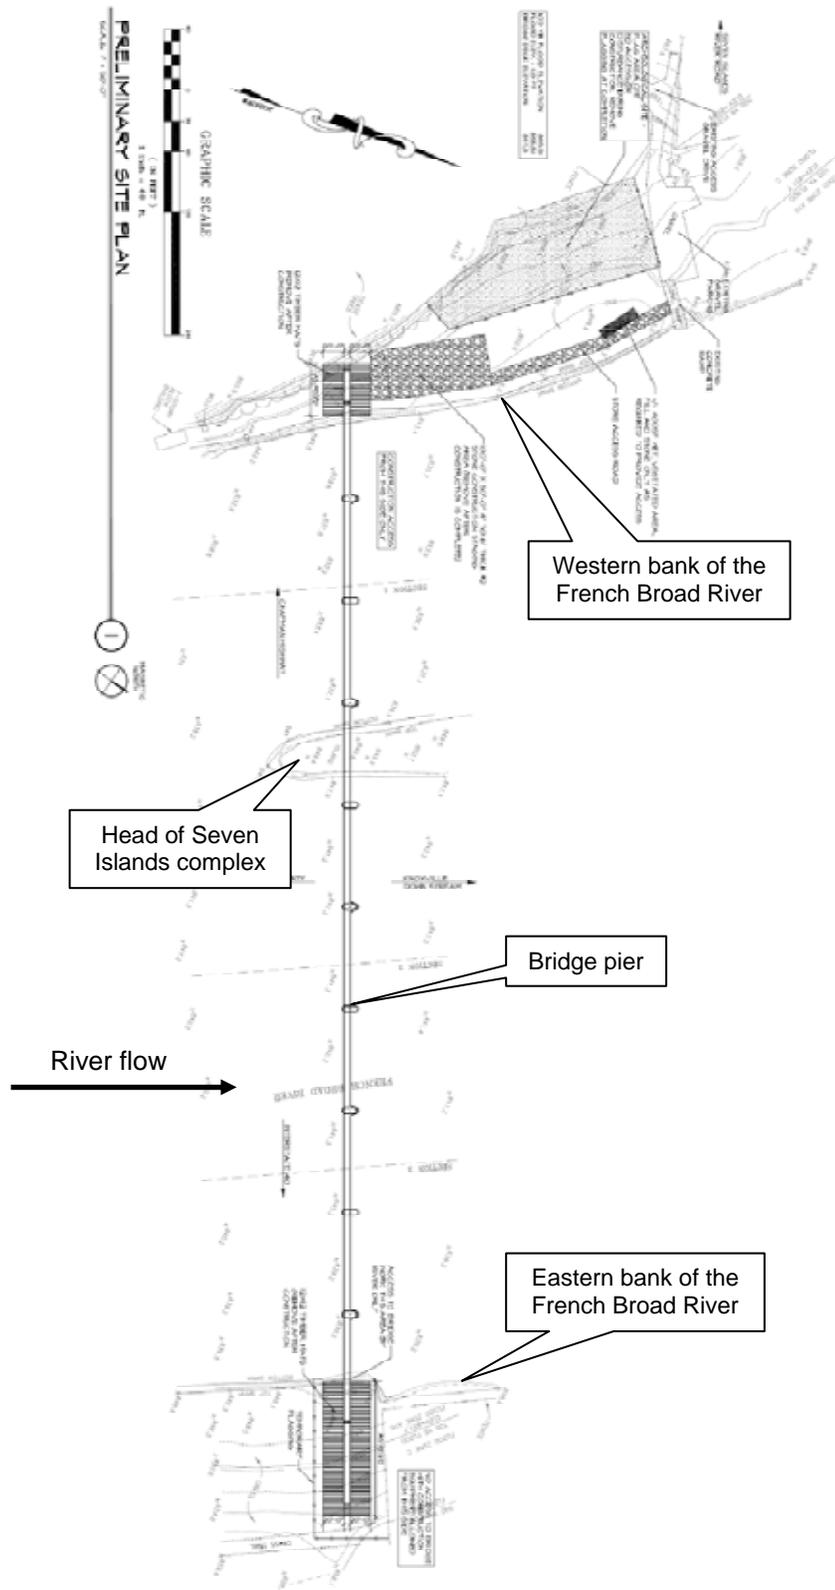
Schematic Plan of the Proposed Seven Islands Pier-Type Bridge
